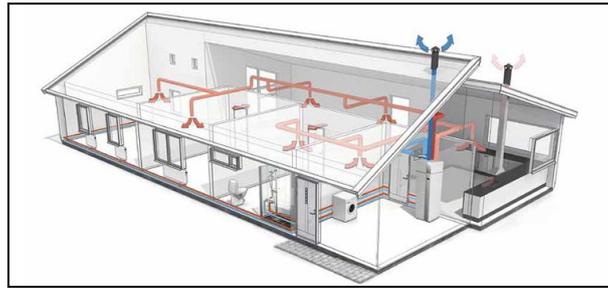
Example Diagram of Typical Exhaust Air Heat Pump Layout
